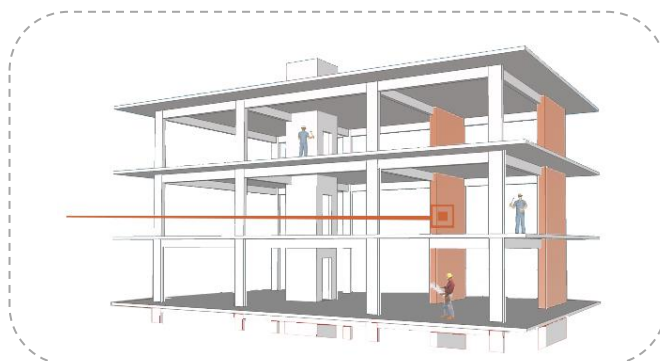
The highlighted shows the shear walls in the traditional construction.
